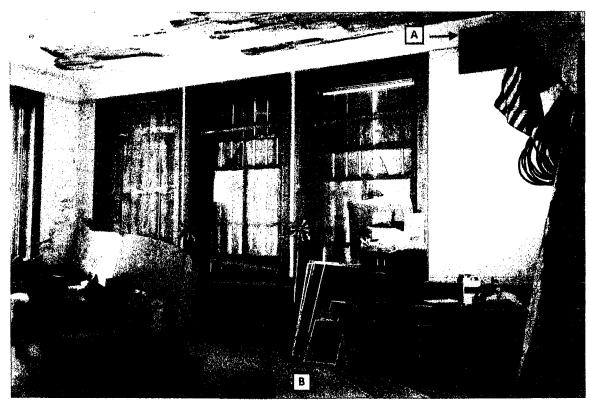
Room 8 view east. (A) East wall upper fresh air gravity vent, (B) Floorboards are warped.
